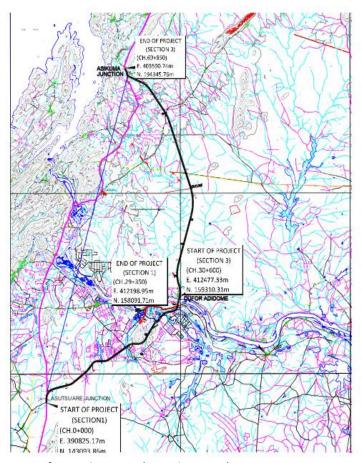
Final Alignments for Sections 1 and 3 Project Roads
